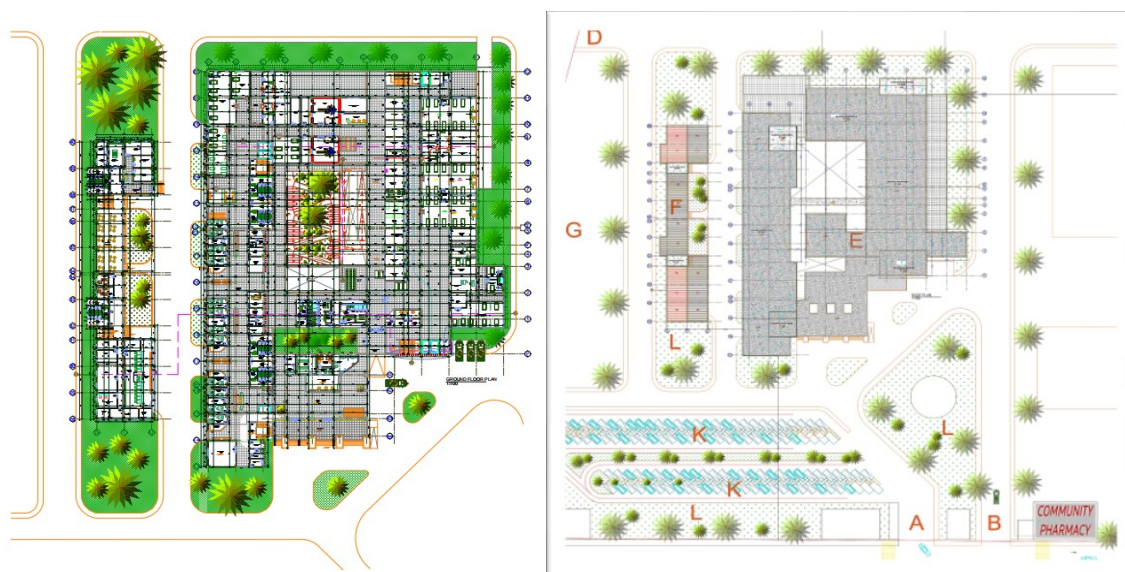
Architectural Layout and Ground Floor Plan for Administration and MHB
